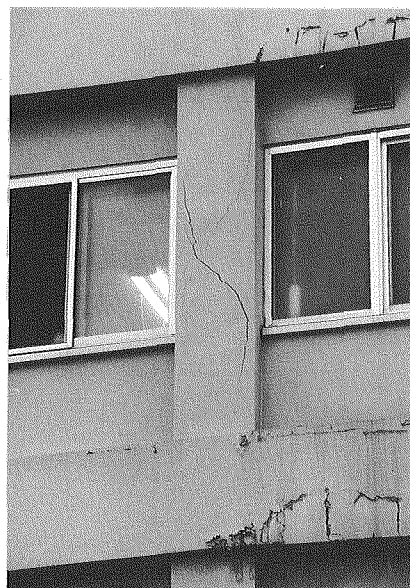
Shear failure of shear wall (Nemuro Hospital)
